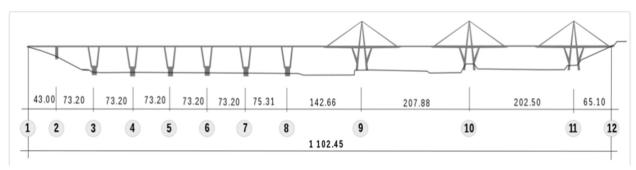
Perspective Drawing of Morandi Bridge [16]
